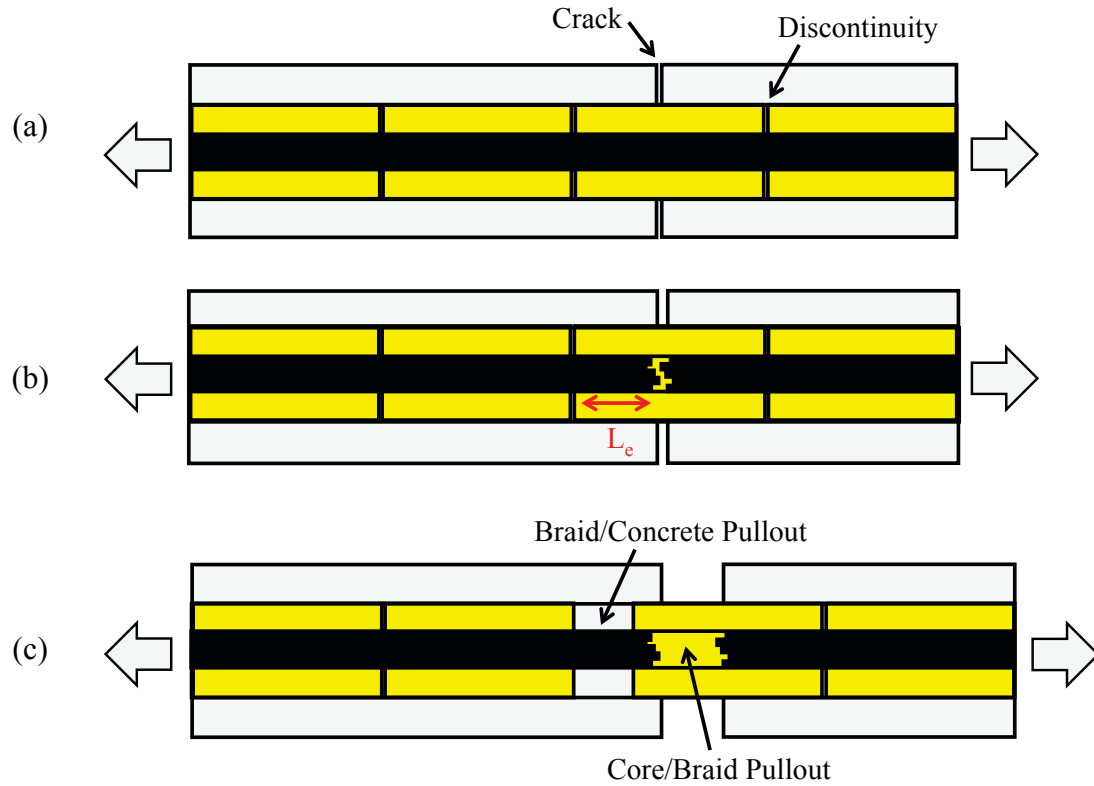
Schematic of proposed failure mechanism for discontinuous rebar design. (a) Crack formed in concrete between discontinuities in rebar, (b) yielding of rebar at crack location, (c) pullout of rebar after reloading
